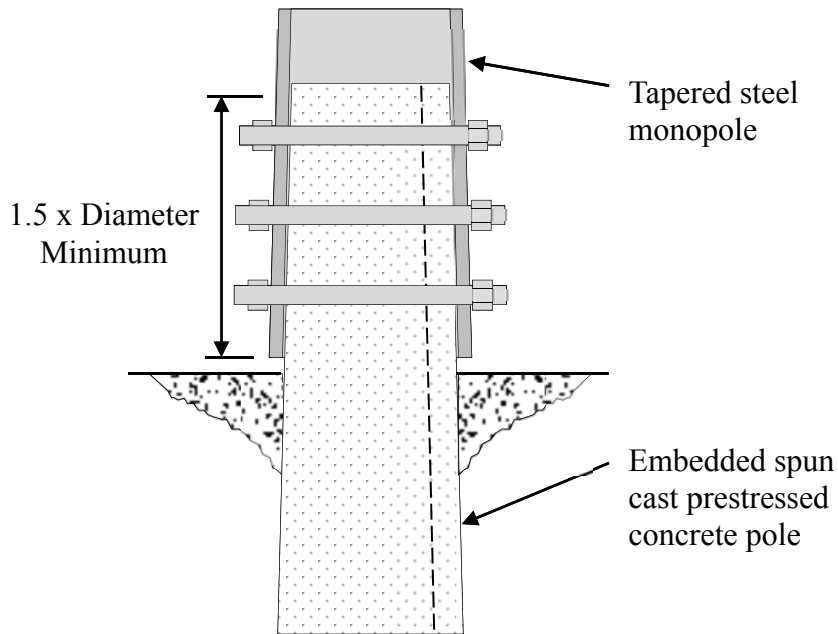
Spun cast prestressed concrete and steel connection shown with through-bolts
